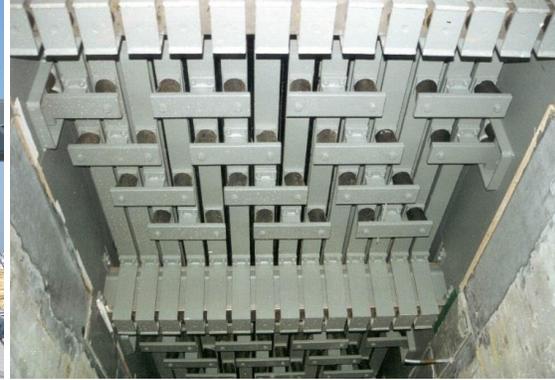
An installed Tensa-Modular expansion joint, viewed from below.
